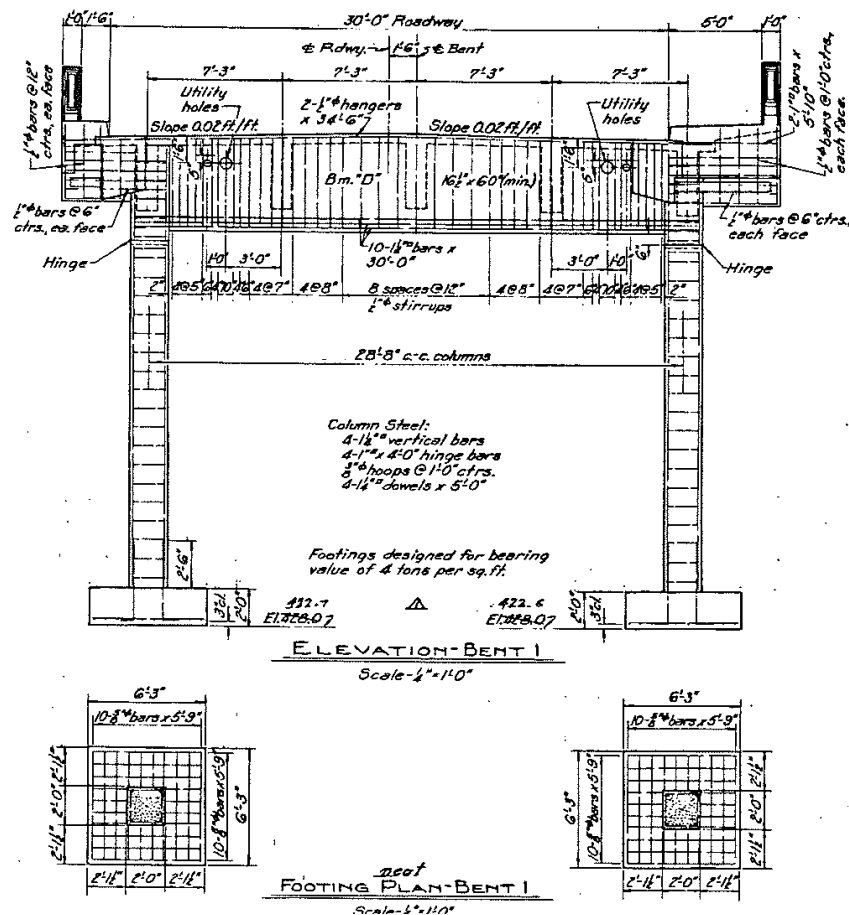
Typical nonductile reinforcing details for square columns (short splice length and inadequate confinement).
